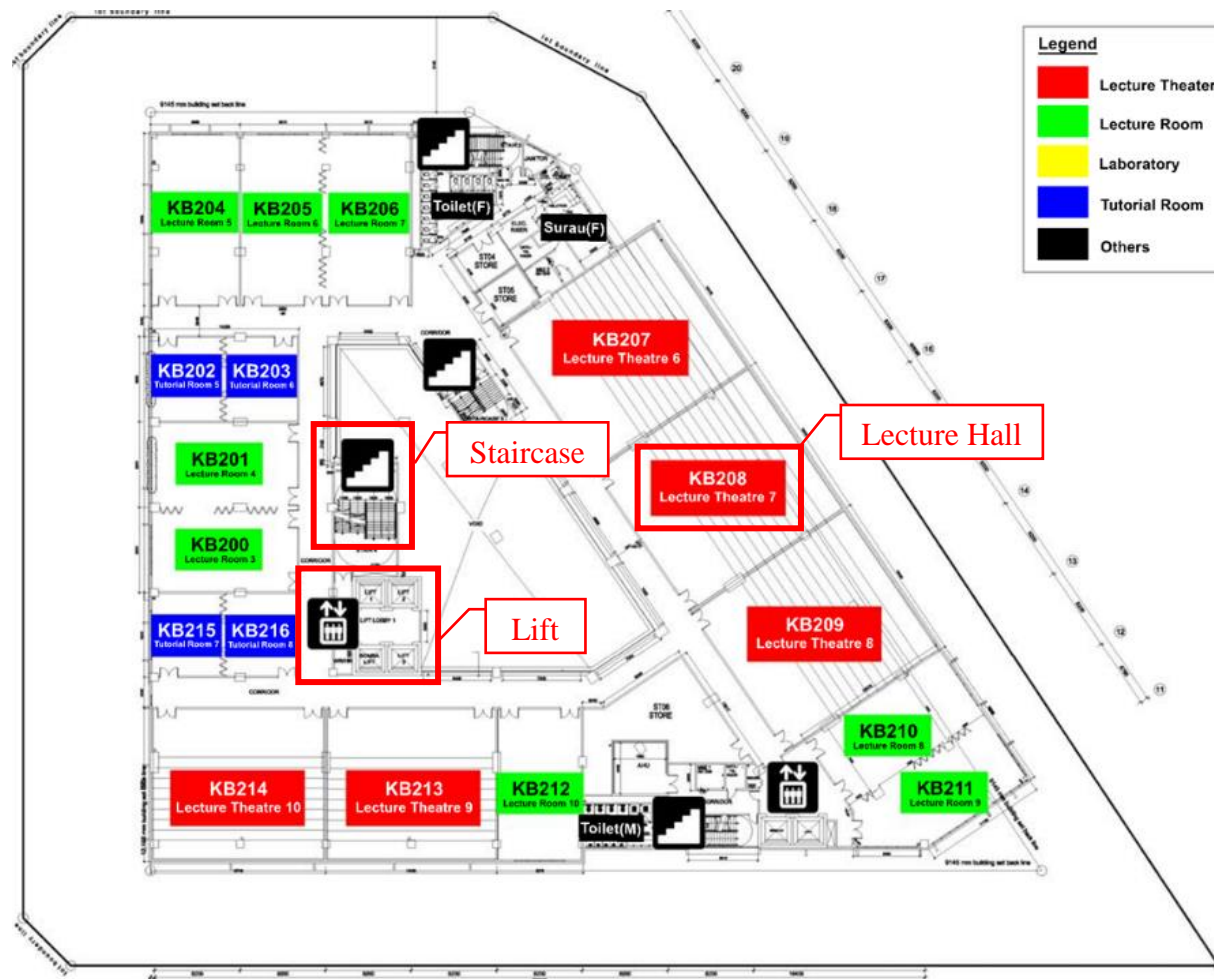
Sungai Long KB building floor plan – 2nd floor.
